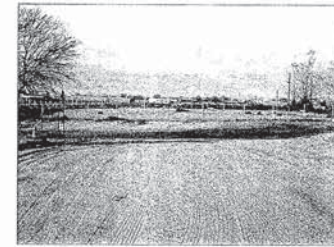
PHOTO 'A' LOOKING NORTH AT DIRT LOT ACROSS
